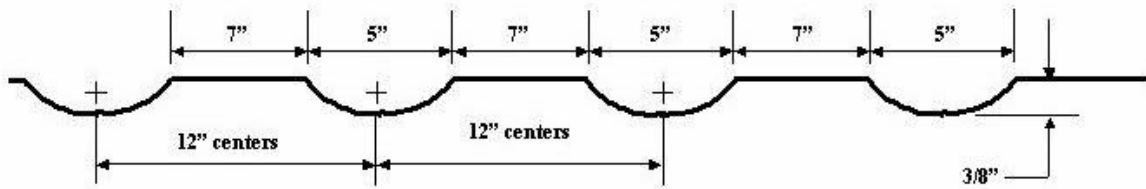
Profile of standard ground-in rumble strip. A typical section of standard ground in rumble strip installed on existing asphalt or concrete pavement.
